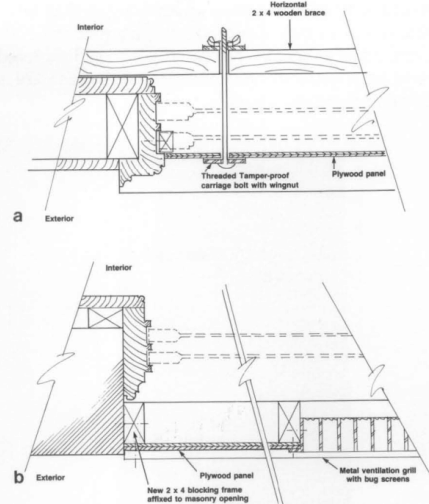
A: Plan detail showing plywood security panel anchored with carriage bolts through to the inside horizontal bracing, or strong backs. B: Plan detail showing section of plywood window panel attached to a new pressure treated wood frame set within the masonry opening. Ventilation should be included whenever possible or necessary.
